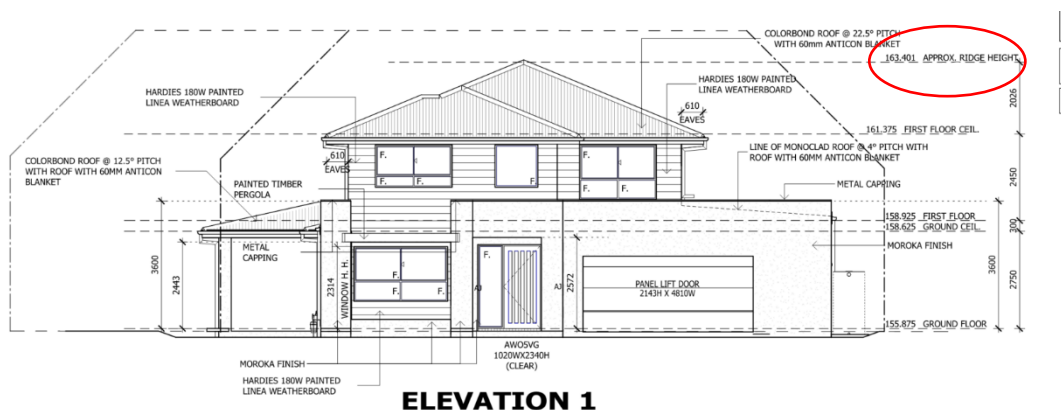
Stamped plans under DA2022/1978 – Elevation 1
